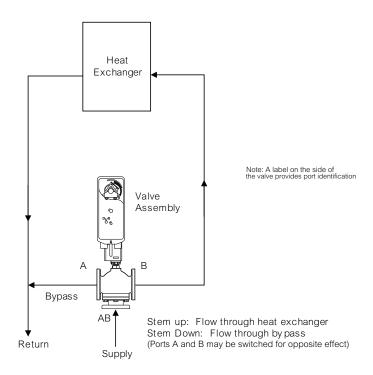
Typical Piping of VB-8303 as 3-Way Diverting Valve
